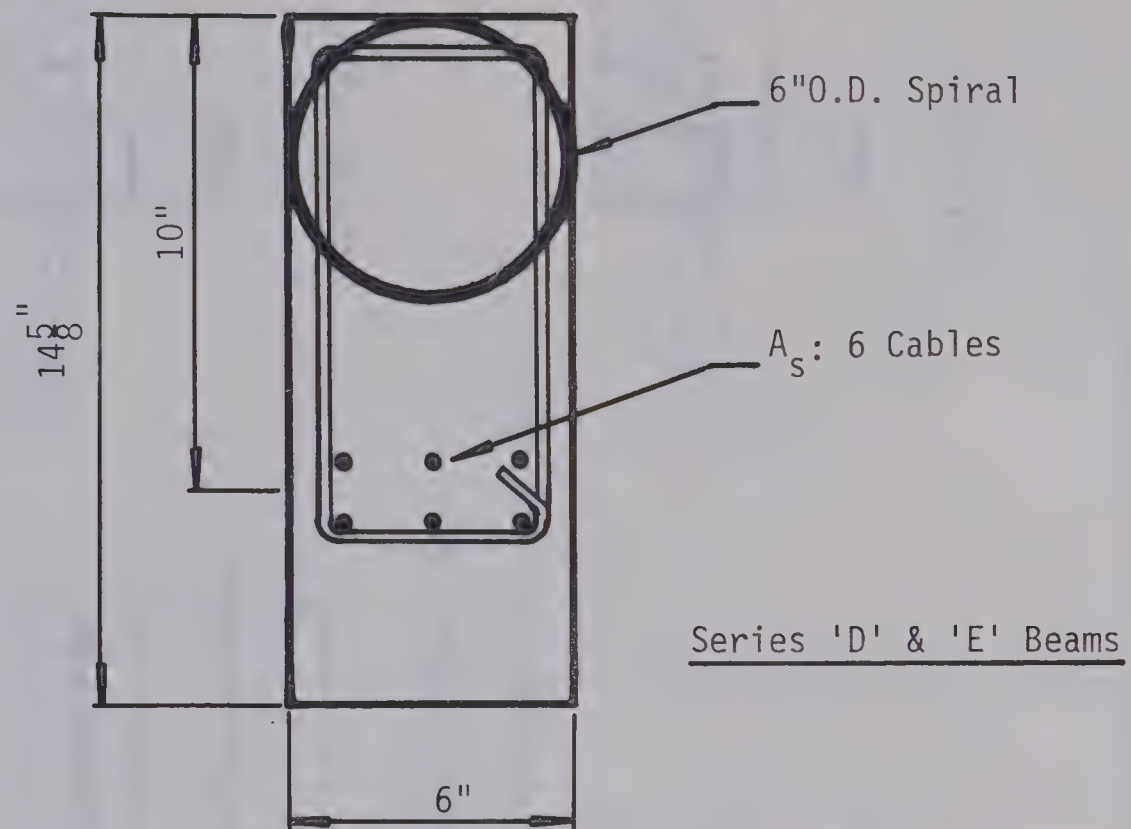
TEST BEAM CROSS-SECTIONS
